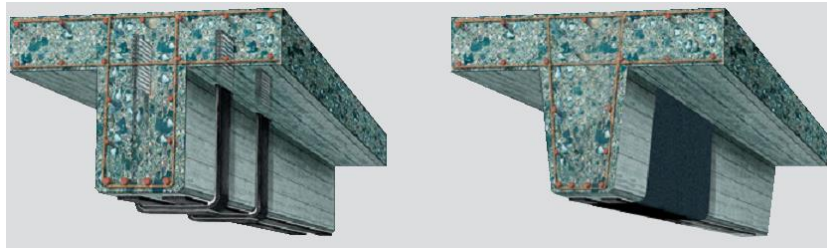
Flexural and shear strengthening of reinforced concrete beams [18].
